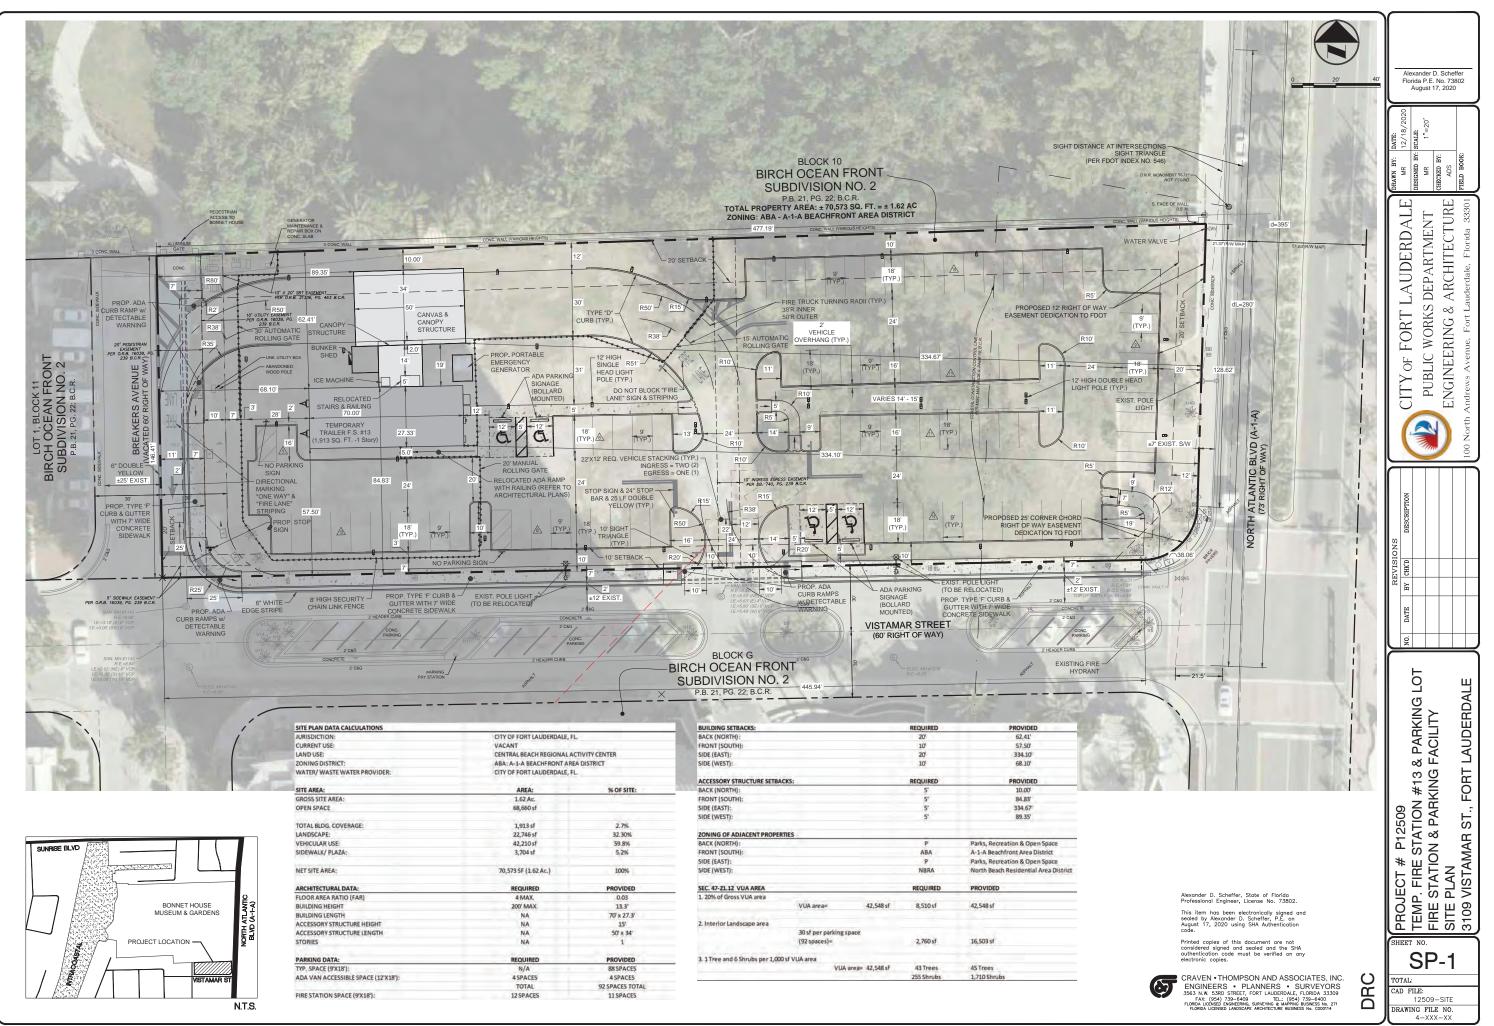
EXHIBIT VI: Design Development Drawings Temporary Fire Station #13, located at 3109 Vistamar Street
